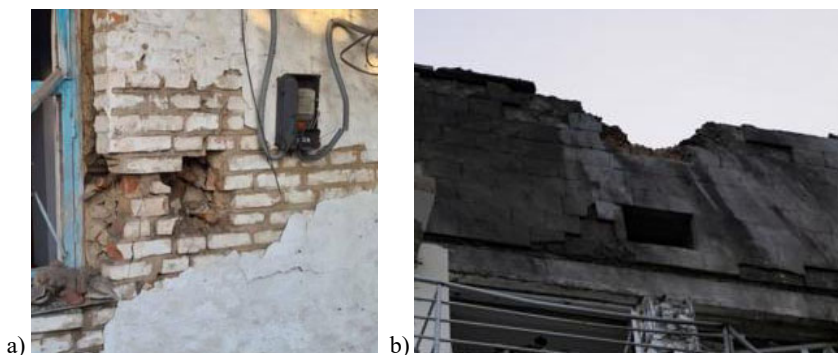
Formation of vertical and inclined cracks in brickwork
